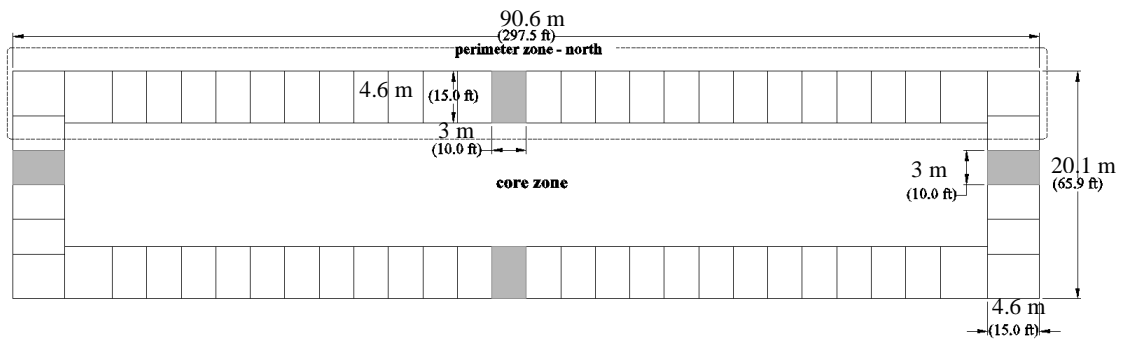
Long thin building of 1,519 m² (16,350 ft²) facing (N-S).
